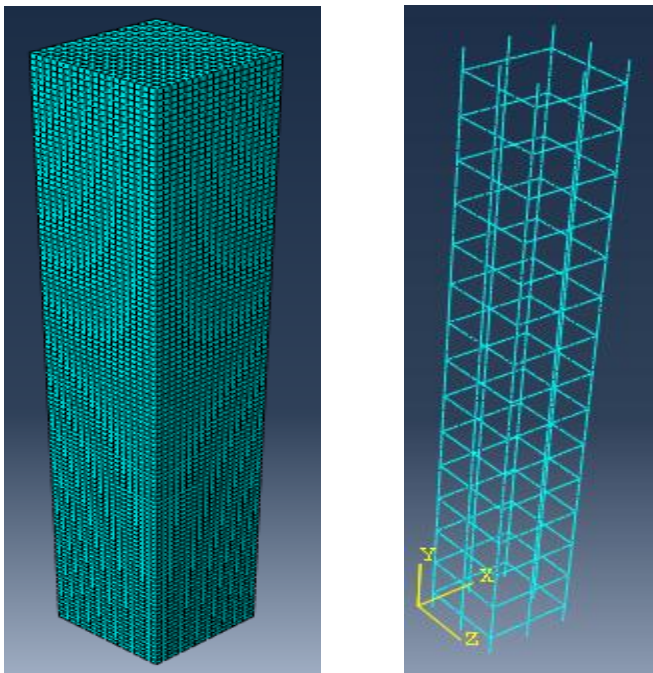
Meshing of concrete column and tied reinforcement bar
